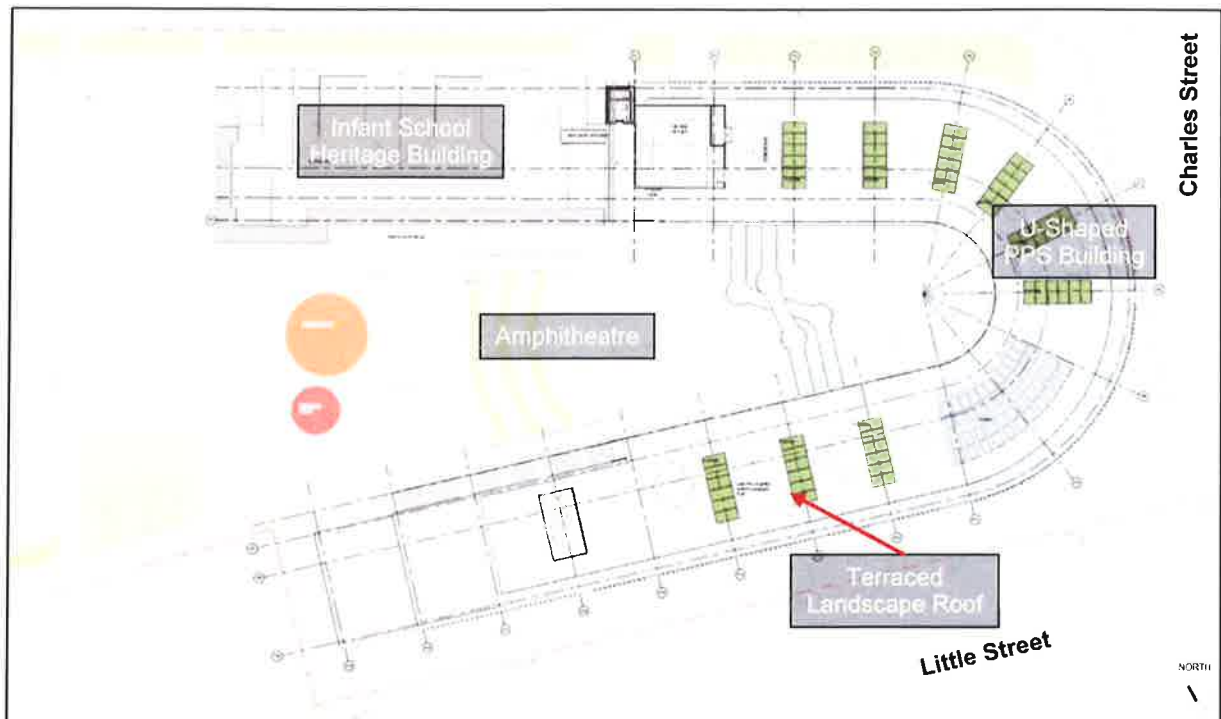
PPS Project site layout (Roof Plan) (source: Applicant)
